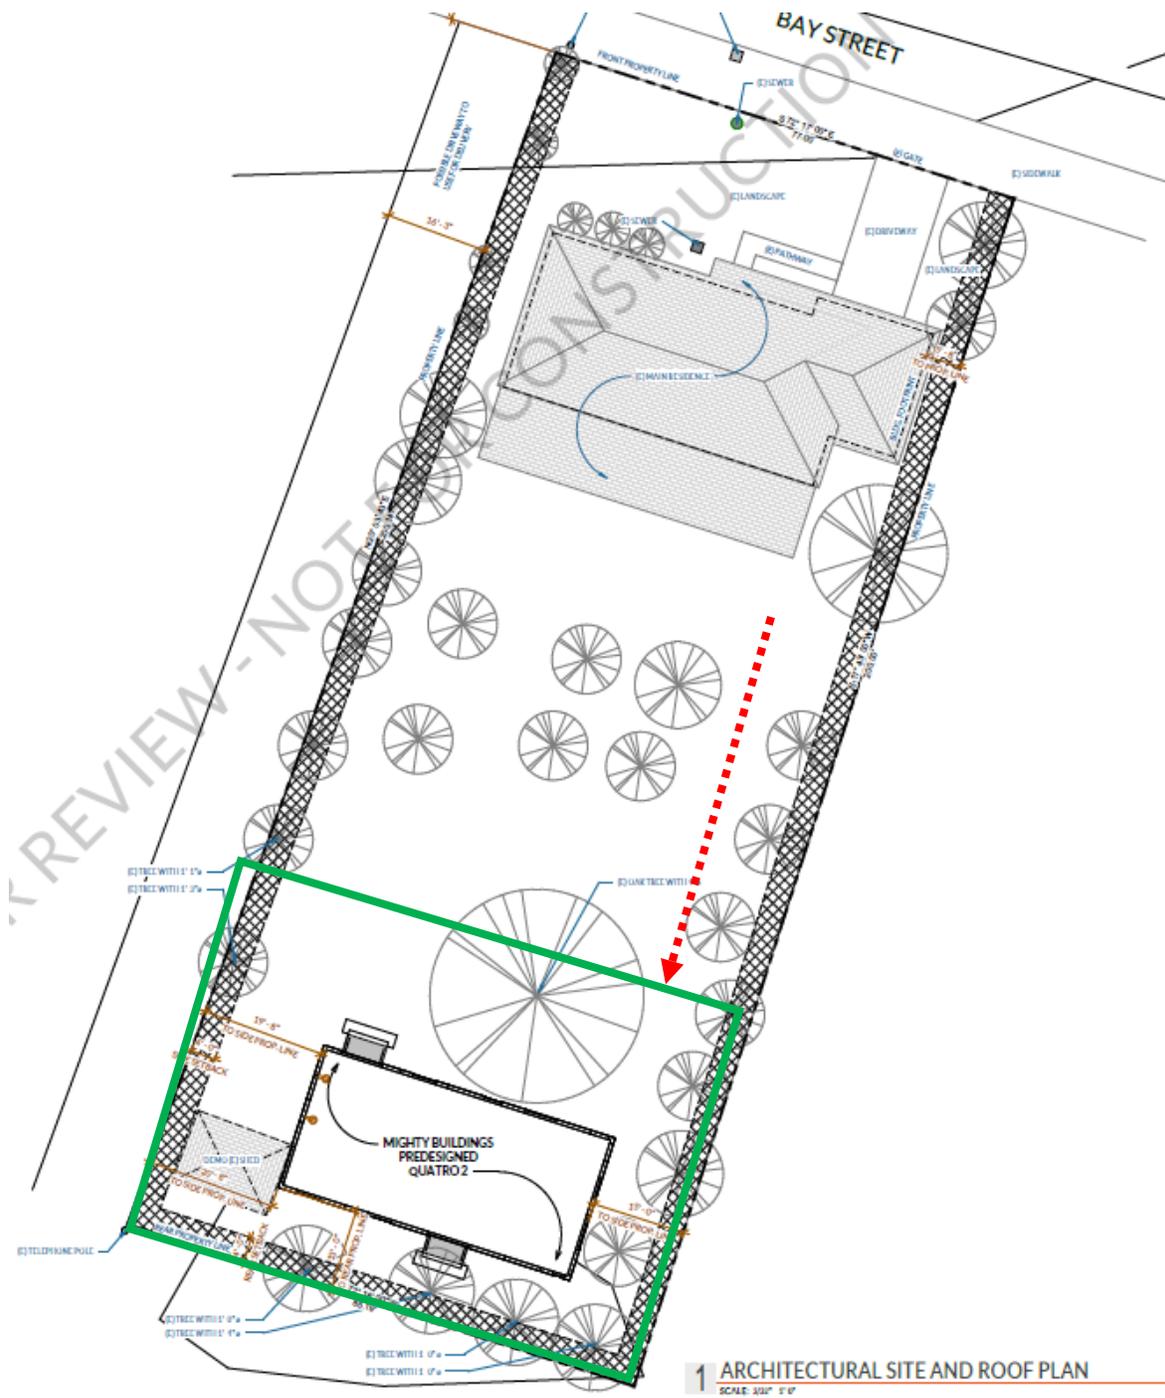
the site plan for the project. The proposed ADU and its area to impact roots is shown in green. A path of travel will need to be established and routed outside of the dripline of any protected tree. The recommended path of travel is shown with a red dashed line.
